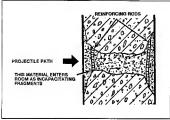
Tank HEAT round effects on reinforced concrete walls.
